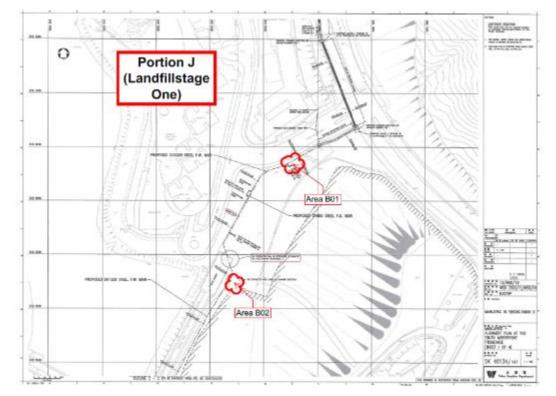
Location Plan – Landfill Stage 1 (Area B01-B02)
